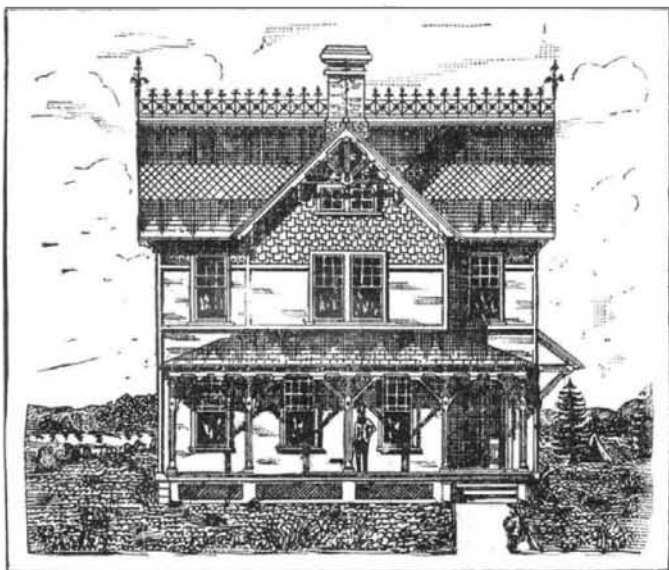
FRONT ELEVATION OF HOUSE COSTING \$2,500.
